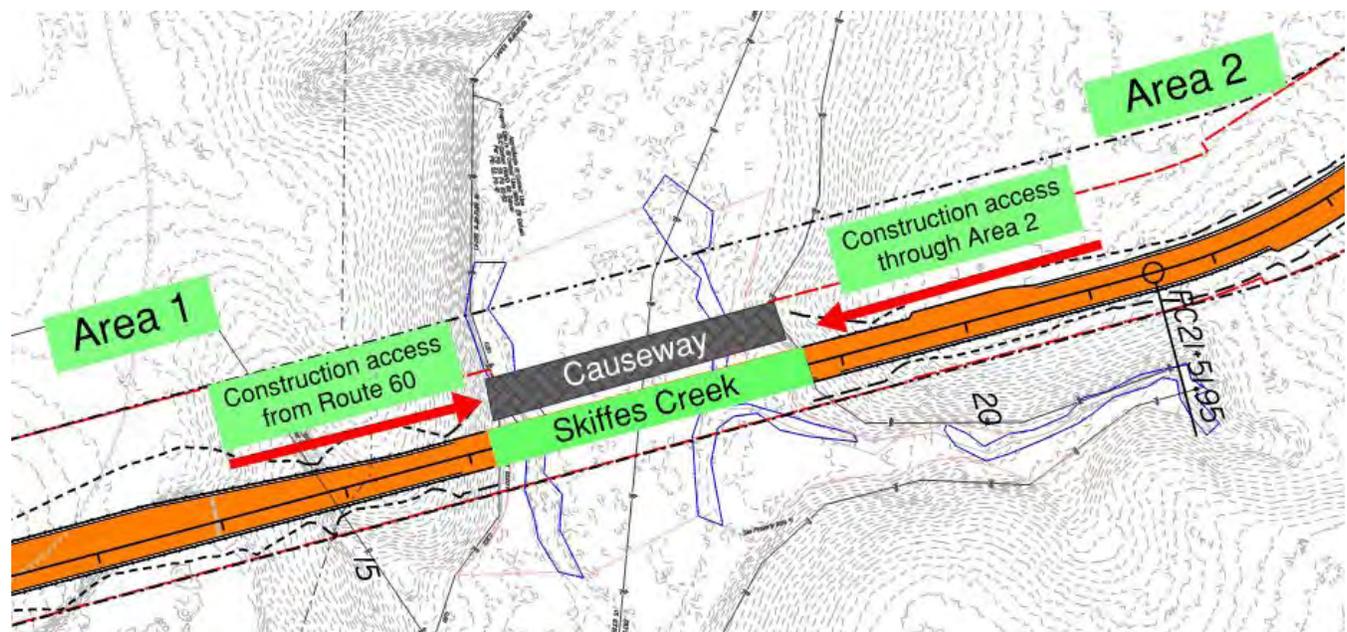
Stage 2- Skiffes Creek Bridge Access
